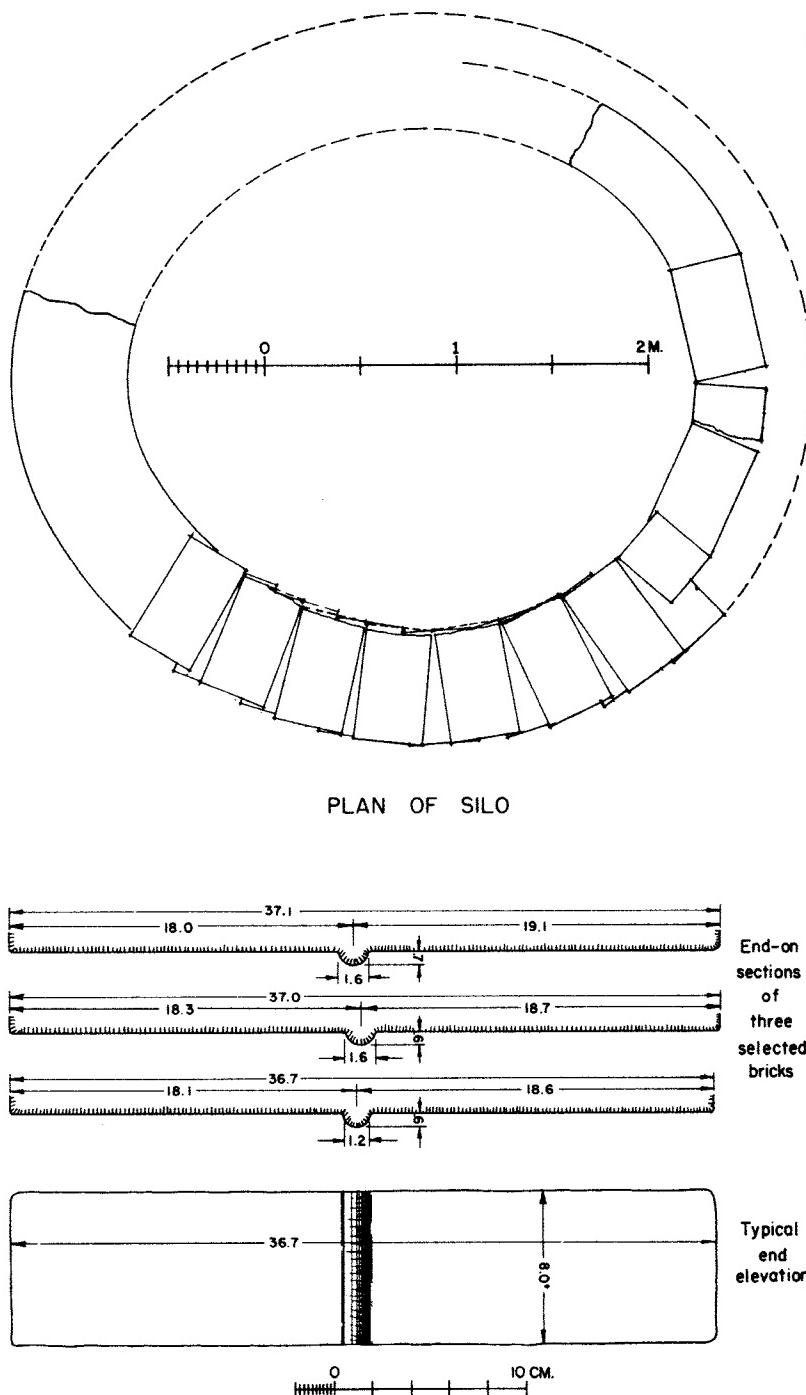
SECOND MIXED RANGE. PLAN AND DETAILS OF SILO LET DOWN FROM JUDAIAH JK 3:2
